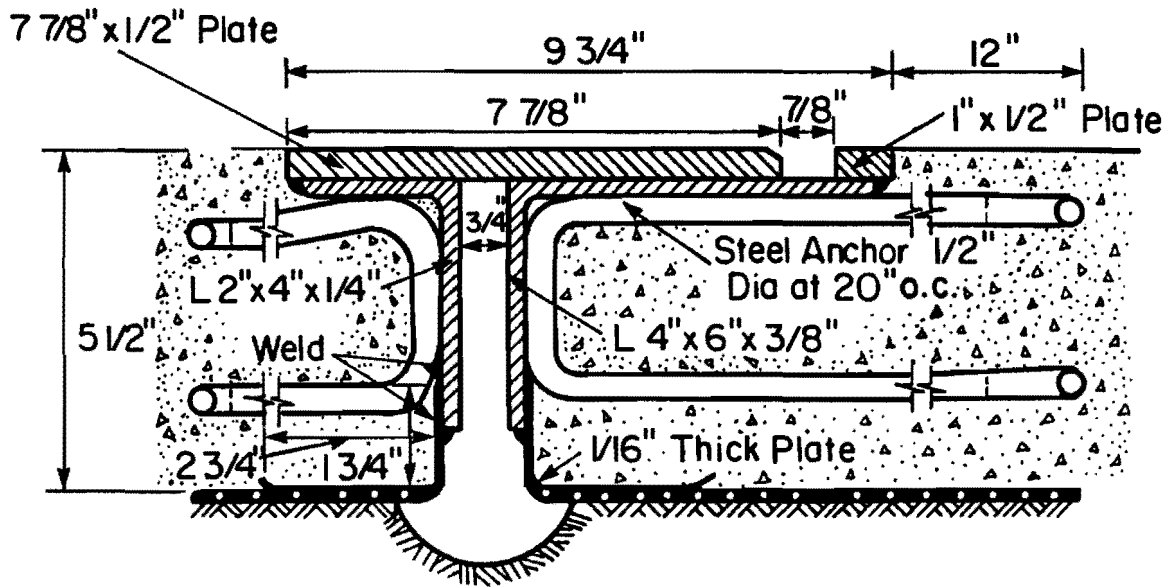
Covered joint for airfield pavements in Germany (Ref 56).
